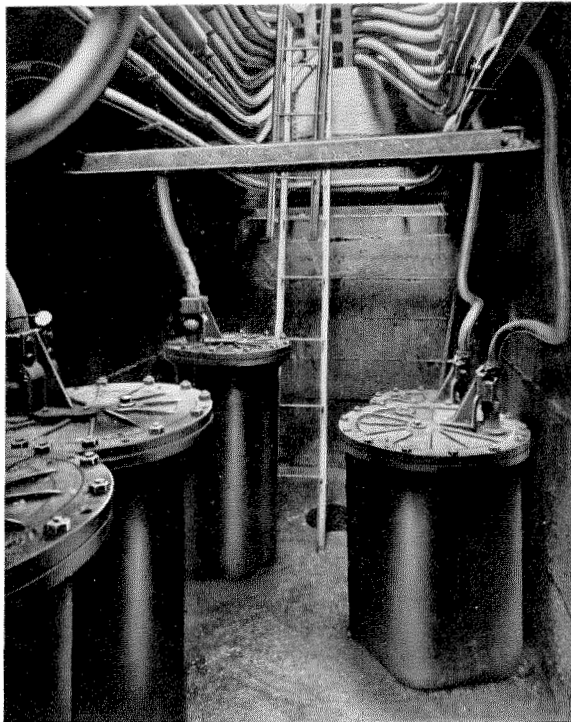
Underground Cable Loading Coil Installation in Metropolitan Area. Double-deck Vault Having ultimate capacity of 14 Large Coil Cases
